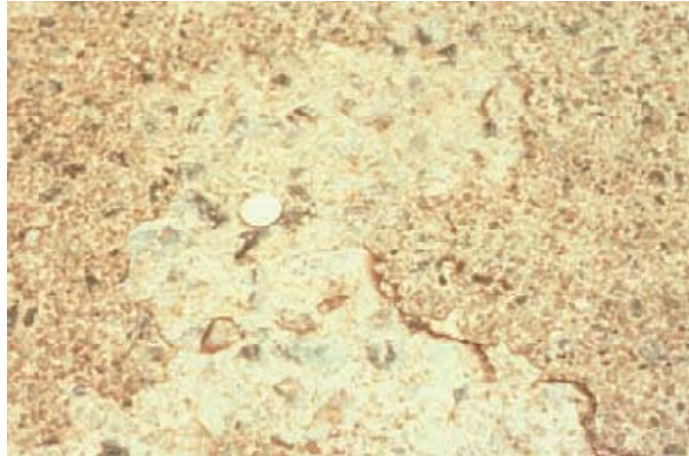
Spalling on concrete deck surface (FHWA 2006)
